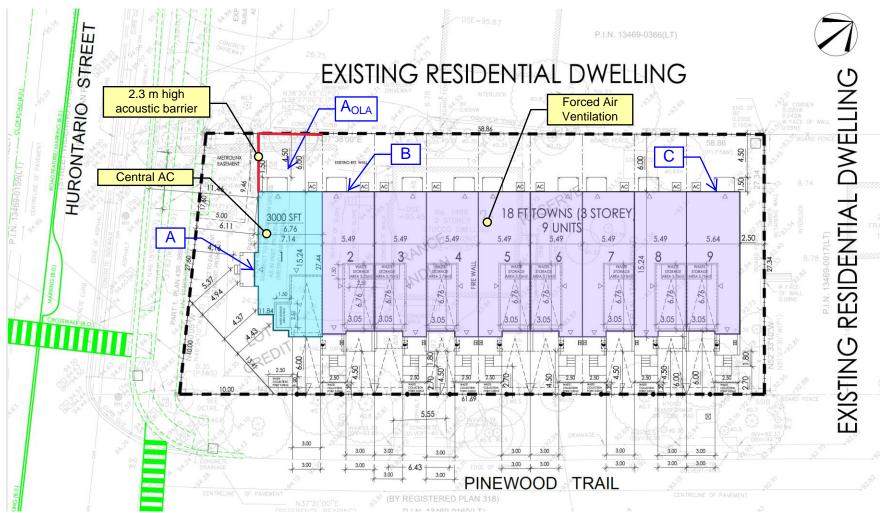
Proposed Site Plan Showing Barrier and Ventilation Requirements
